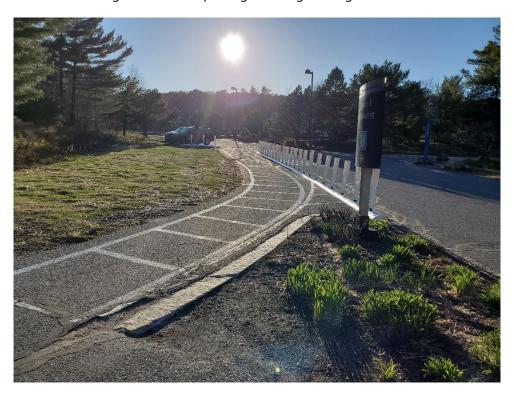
Looking south towards the existing entrance from lowest row of parking.
